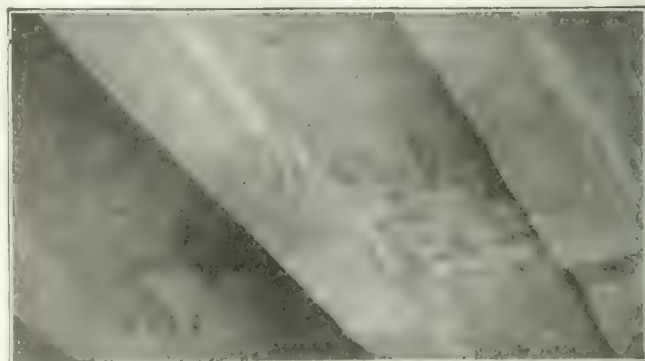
BLAST WEAR ON CONCRETE UNDER SLAB
